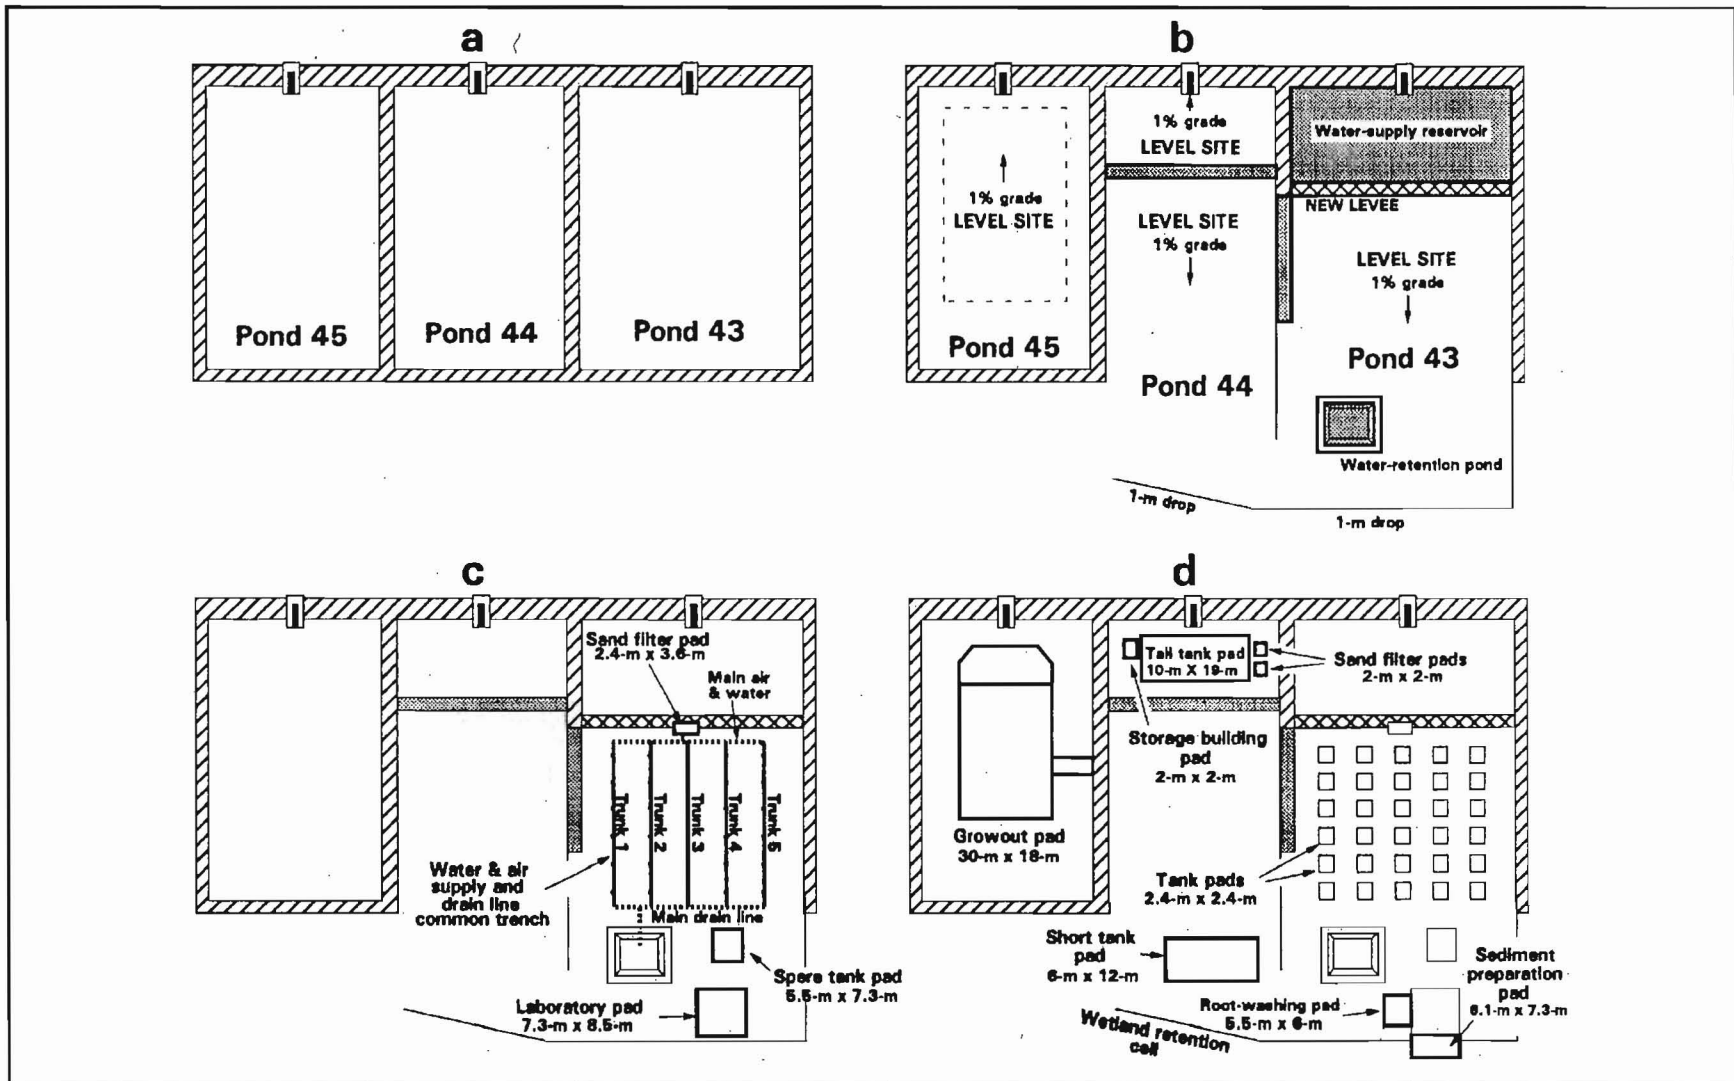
Progression of mesocosm system development: (a) original design of Ponds 43, 44, and 45; (b) reconstruction of levees and pond bottoms; (c) underground piping systems; and (d) structural (concrete pad) placement and mesocosm support facilities
